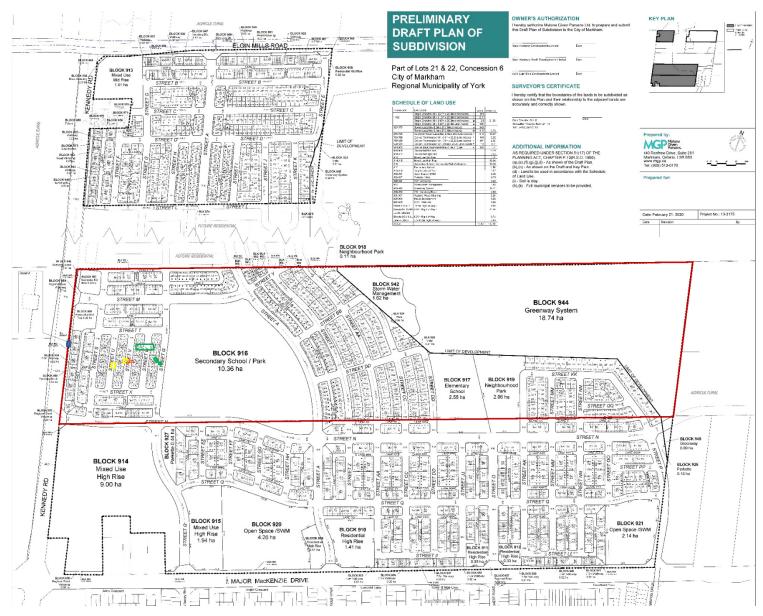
Preliminary draft plan of subdivision with structures from Figure 13 overlaid.
